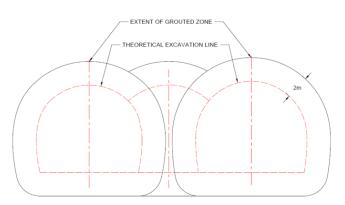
Extents of grouted zone for North Bound, South Bound and Center Tracks.
